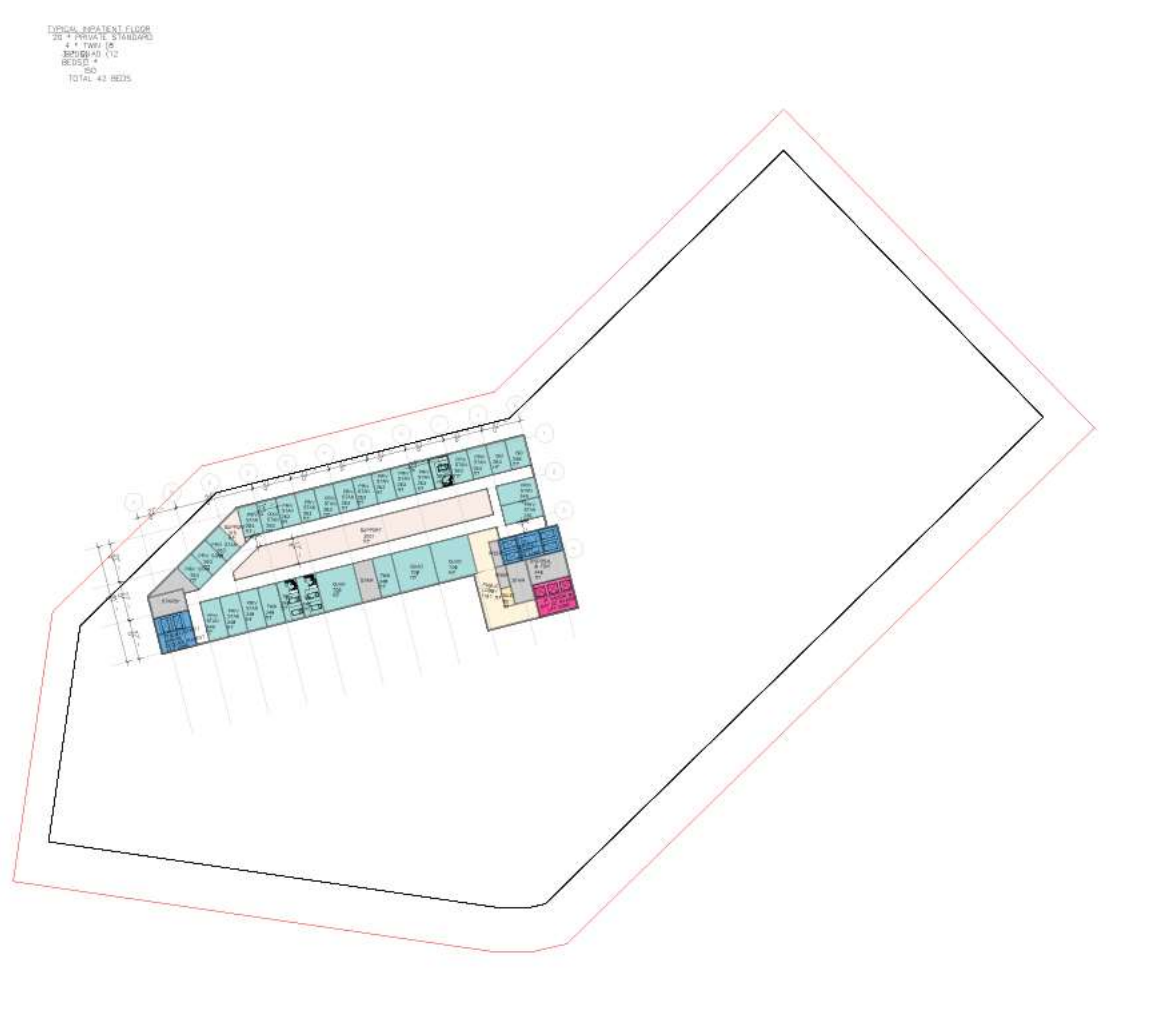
Sixth to Ninth Floor Plan of Novacare Hospital Project
